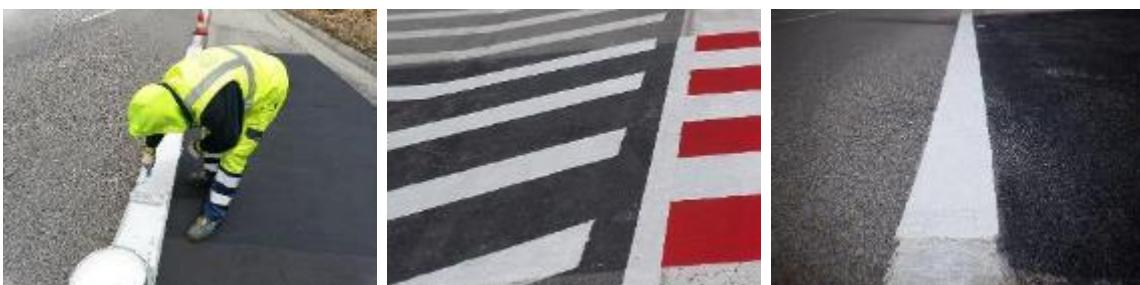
EASY ROAD MARKING REPAIR – APPLICATION EXAMPLES
